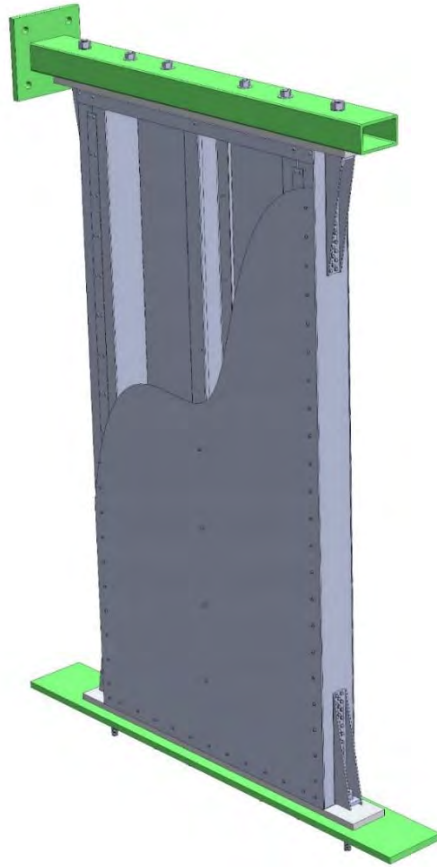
Double-sheathed configuration (front sheathing partially removed in drawing)
